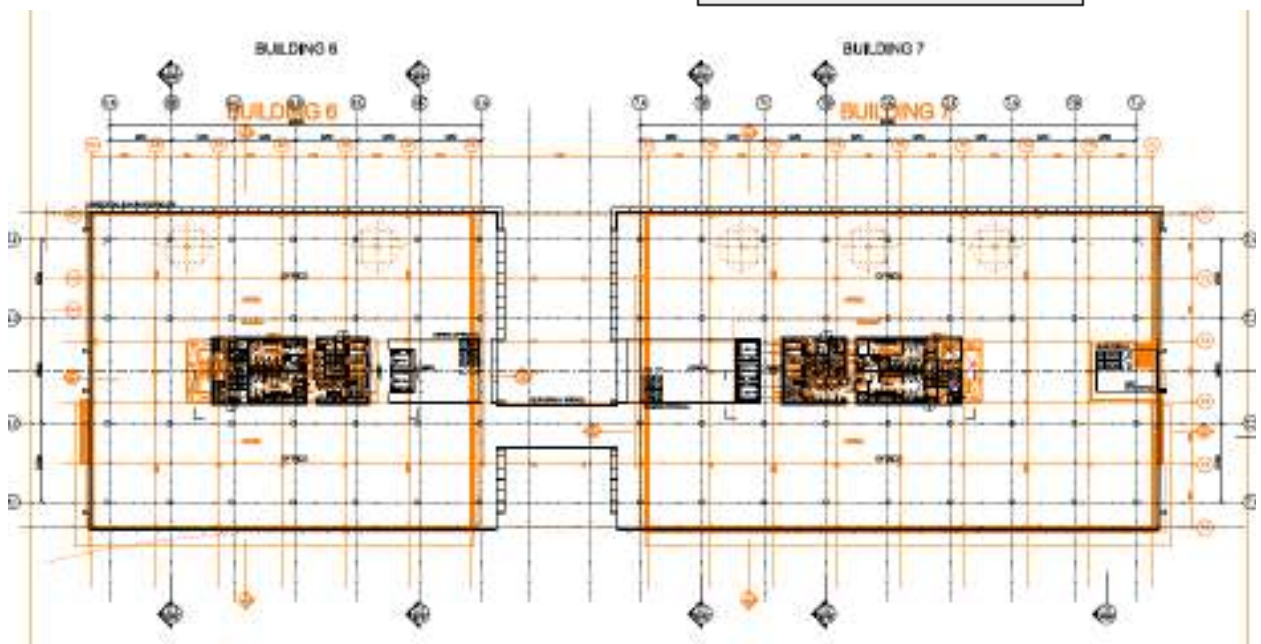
Proposed Level 2 floor plan (depicted in black) overlaid on approved Level 2 floor plan (depicted in orange).
